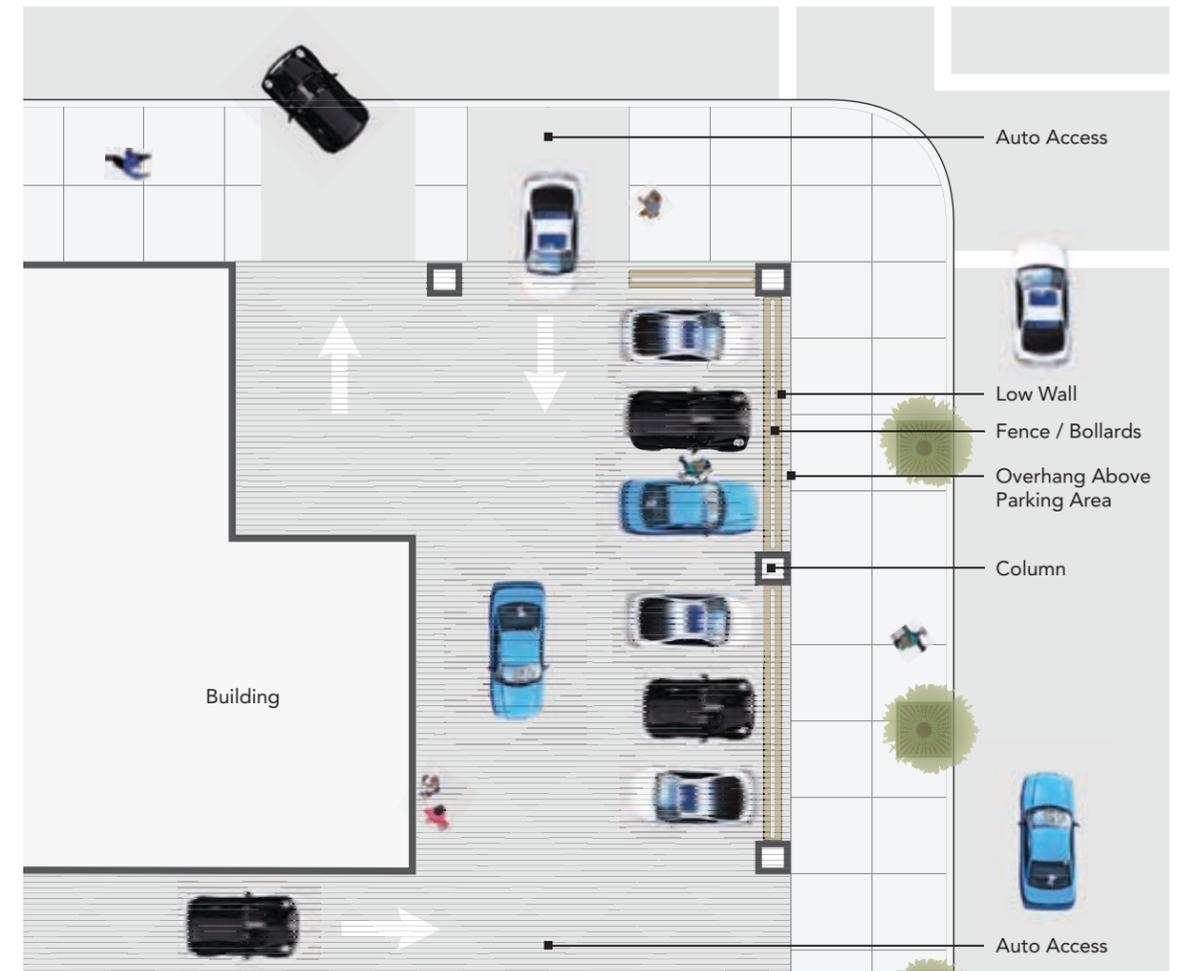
1: Plan view of a corner with parking and auto access along the ground floor of the building.
